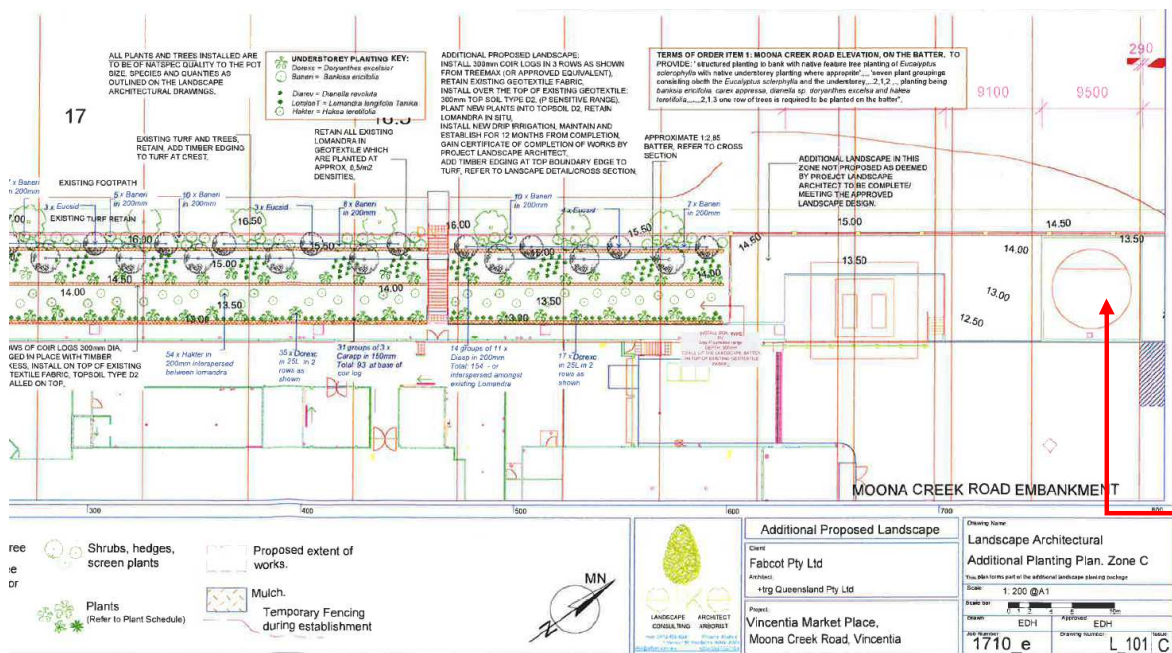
extract from the stamped (18 Jan 2019) mod 7 landscape plan, L\_101\_C shows the northern corner of Moona Creek Road and the existing outline of the sprinkler tank (with the red arrow). Note: there was no additional landscape planting shown in this location for Mod 7 as the existing vegetation including screen planting was already growing and establishing.
